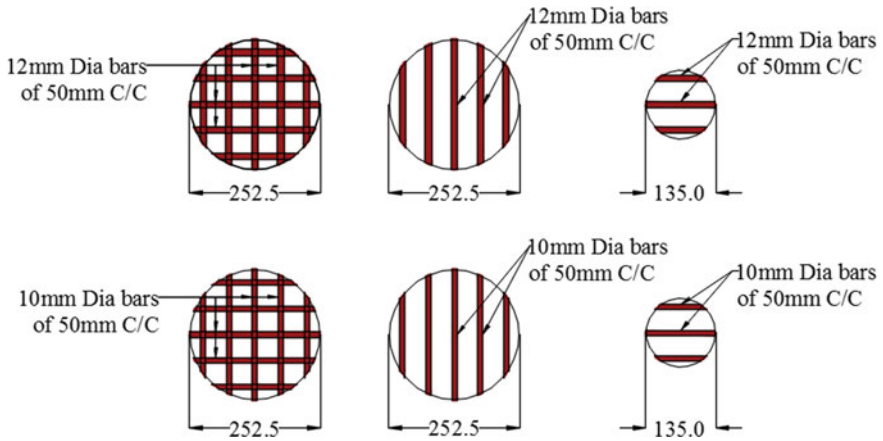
Trial stage cage/mesh (all dimensions in mm)
